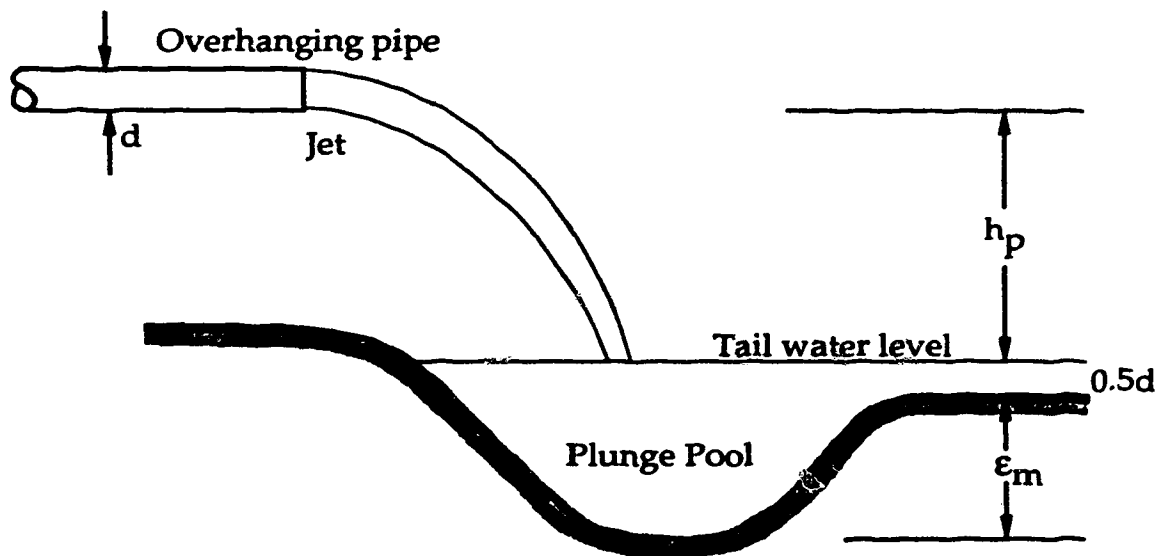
2(b): Definition Sketch for Overhanging Pipe Outlet Erosion
